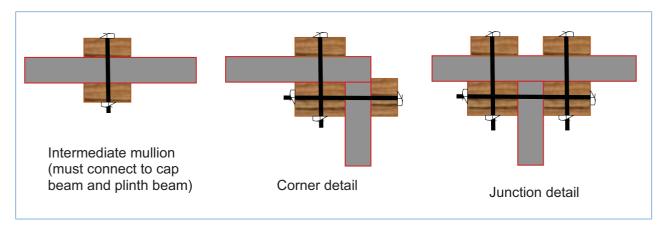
Strengthening of existing masonry constructions with timber posts and beams
